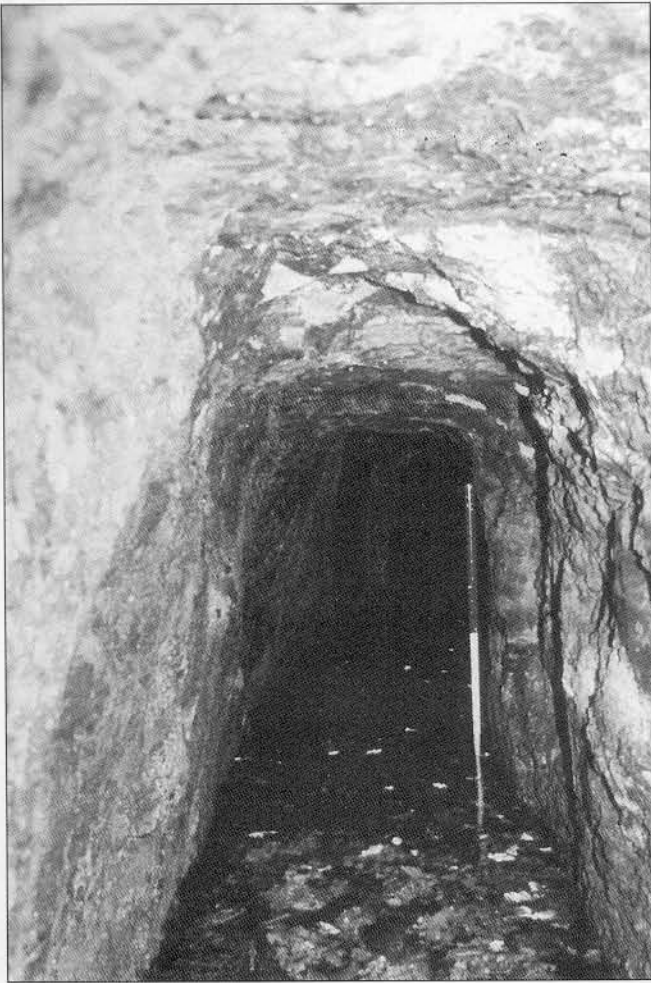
Inside southern tunnel, Shillamill Wood. (M. Munro)
